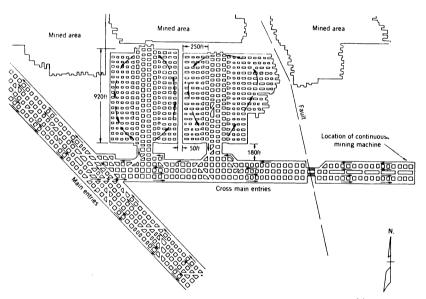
Mining method at Mine 3 (room-and-pillar system).⁽⁵⁾
